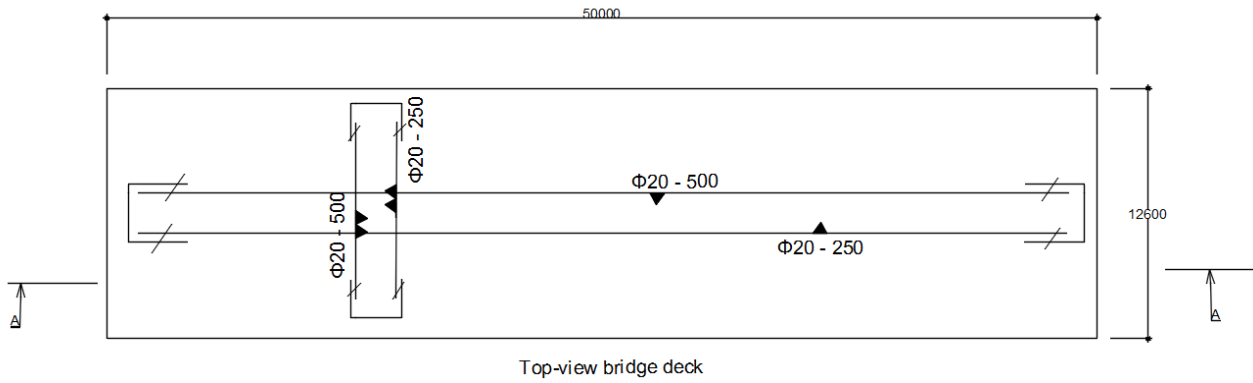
Top-view bridge deck longitudinal reinforcement
